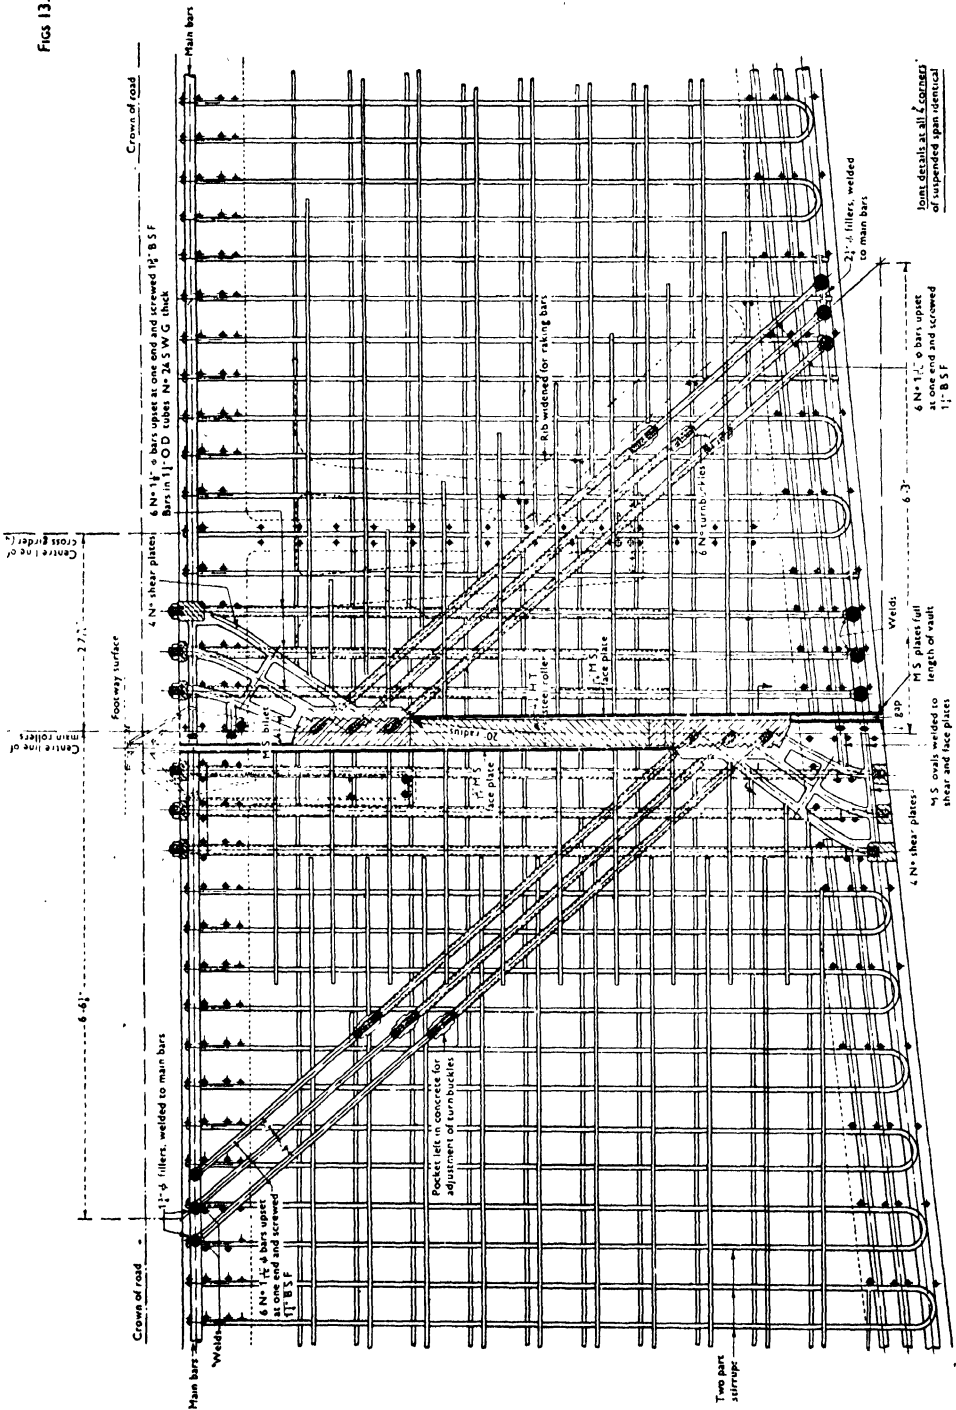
TYPICAL RIB DETAILS, CENTRE SPAN.
